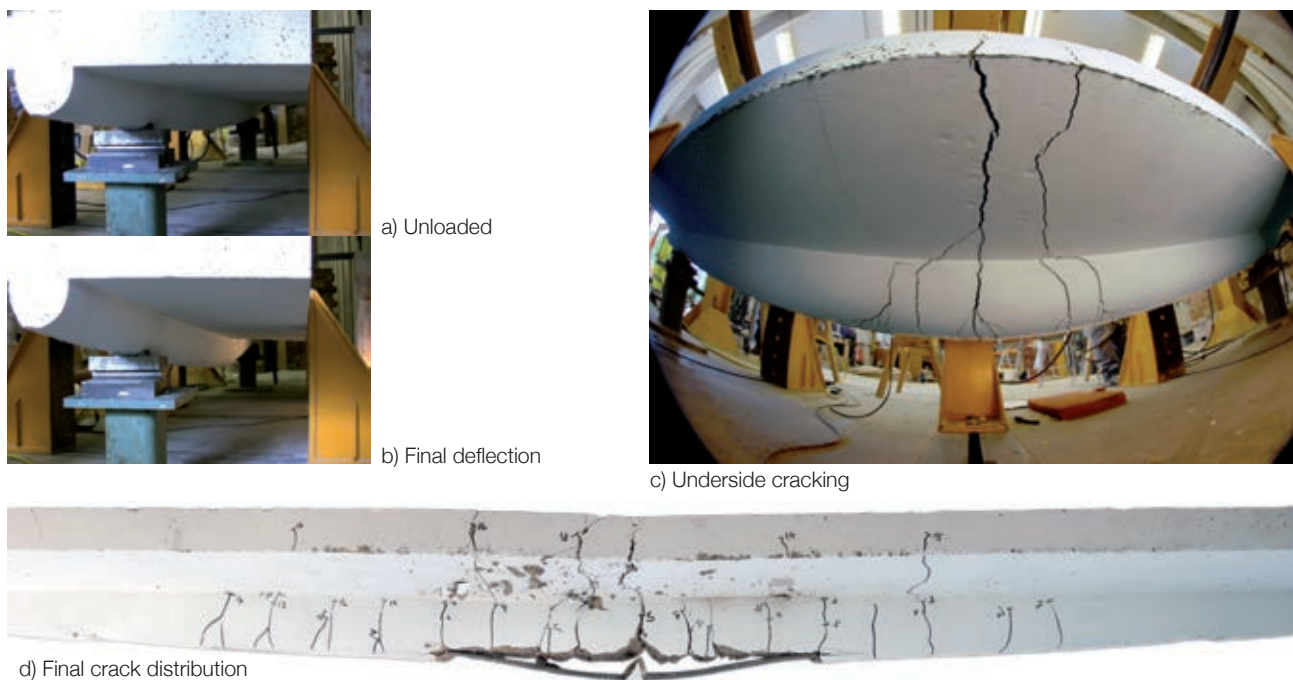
Beam 5\_2\_H\_C crack distribution at failure.
